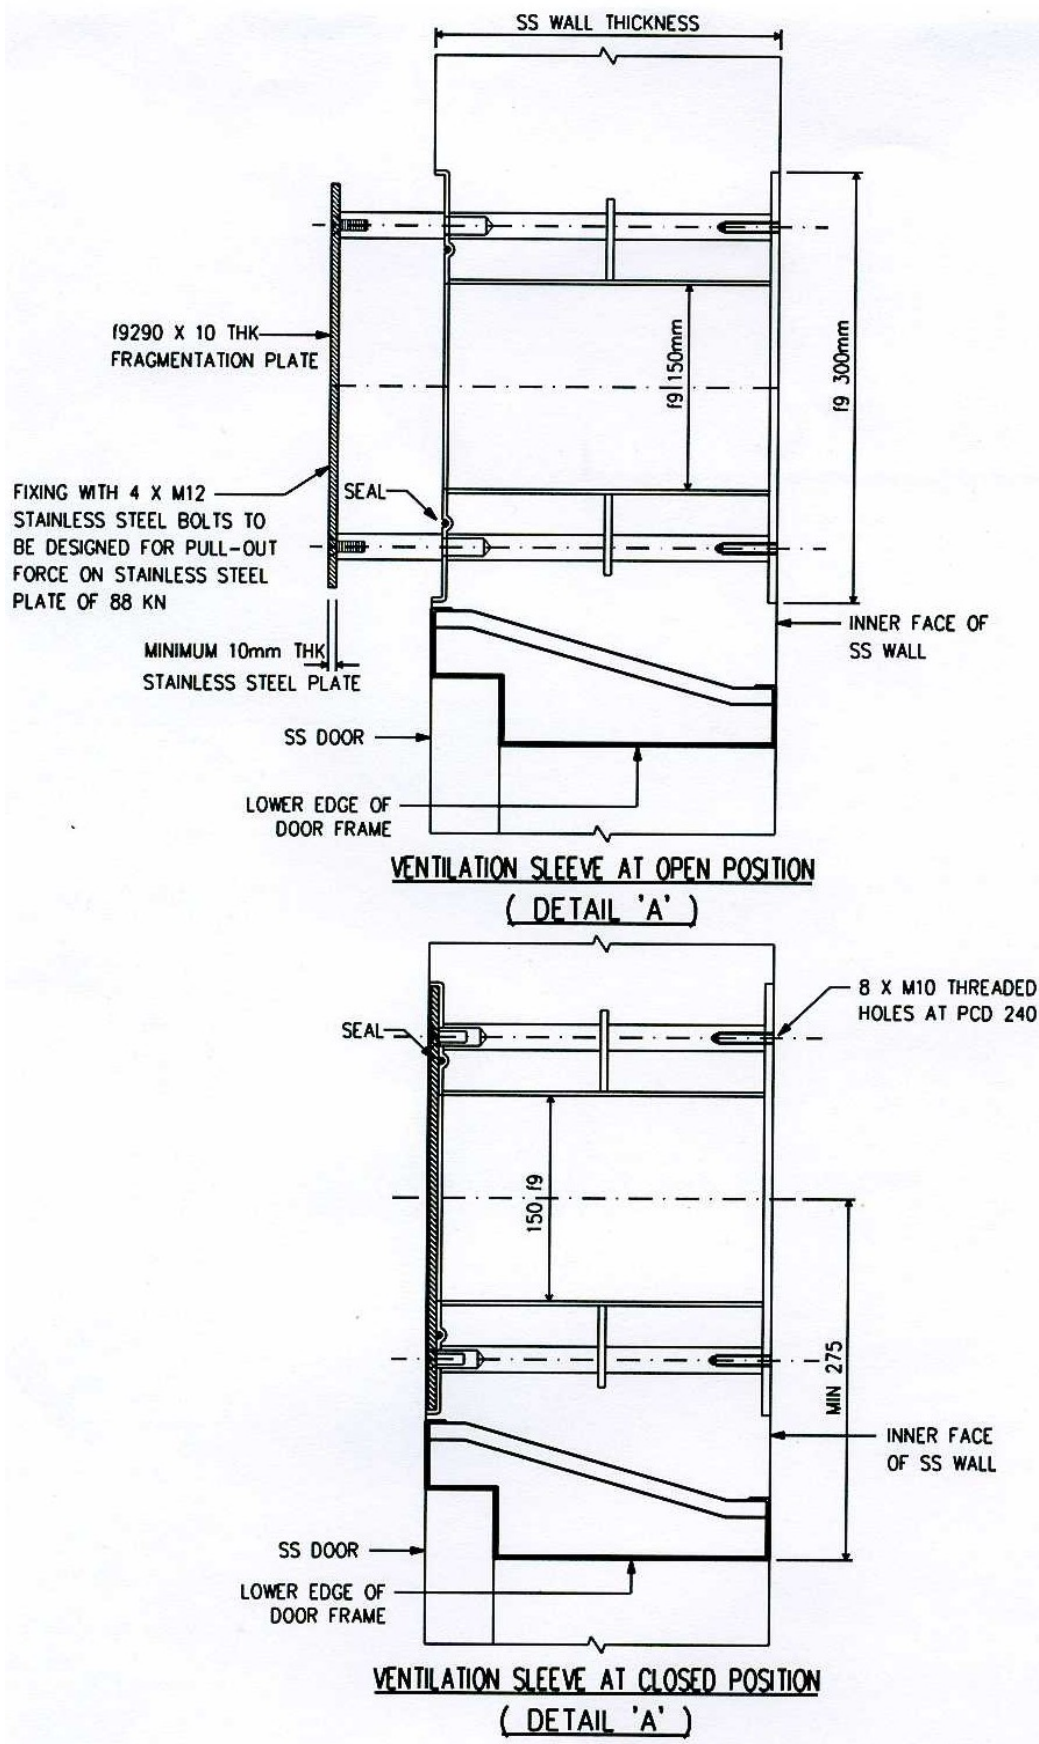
(c) DETAILS OF VENTILATION SLEEVE
